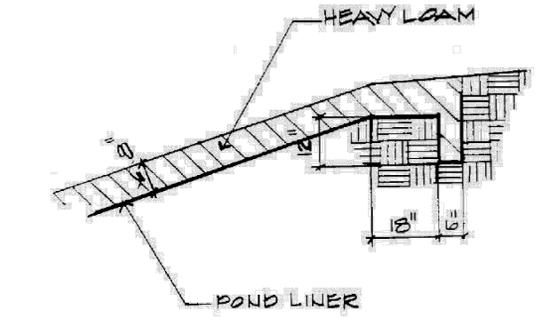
Example of Liner Installation on Earthen Slope (Courtesy COA)
